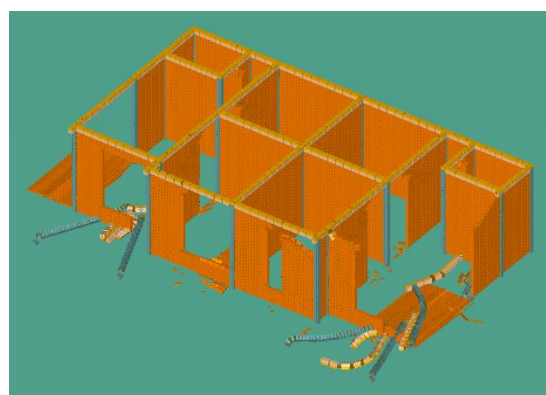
22. Damage Patterns and Damage Level at 0.1g of Elcentro ground motion for RC building Type B with strong (28) concrete strength
